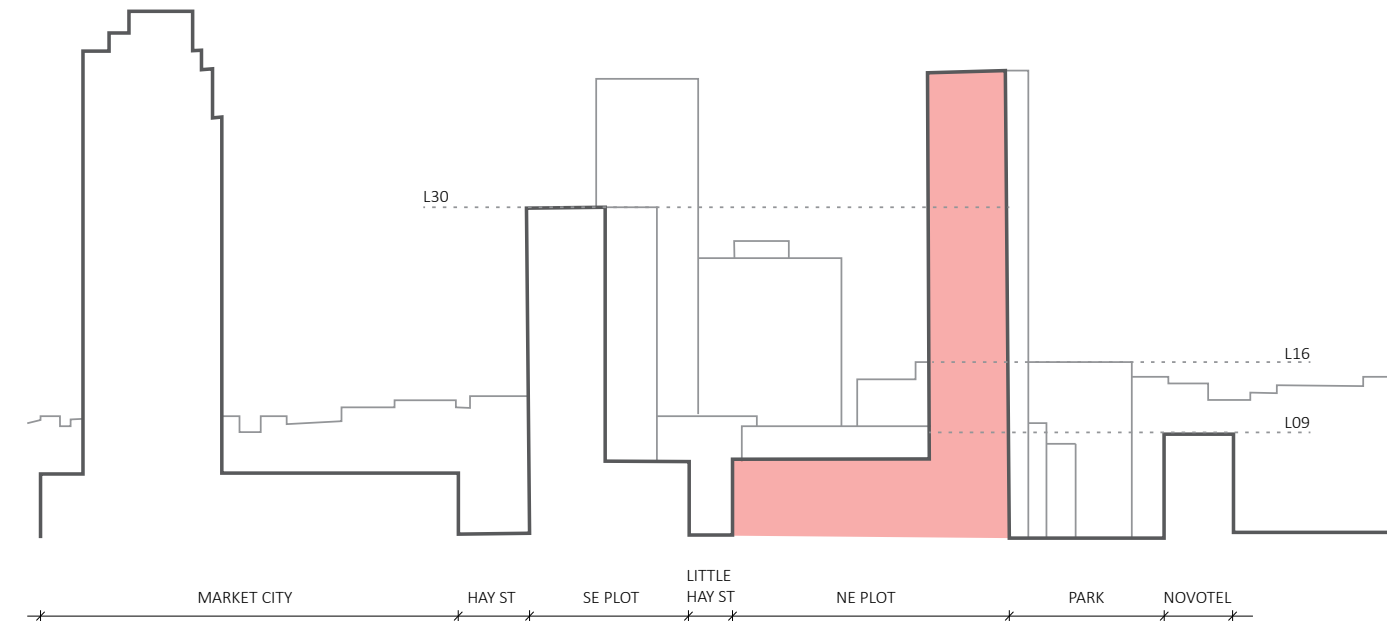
Section - North South study of site context and opportunities for building design and views
